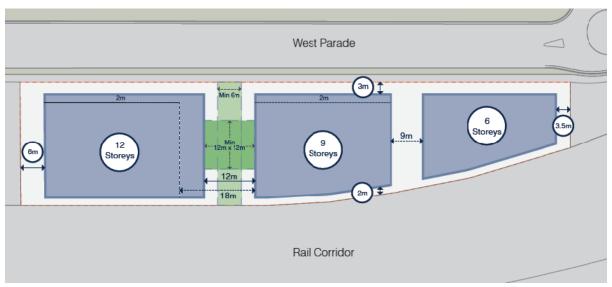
Concept Plan MP09_0029 (Mod 2) Approved Building Envelope (Building Separation and Setbacks).
